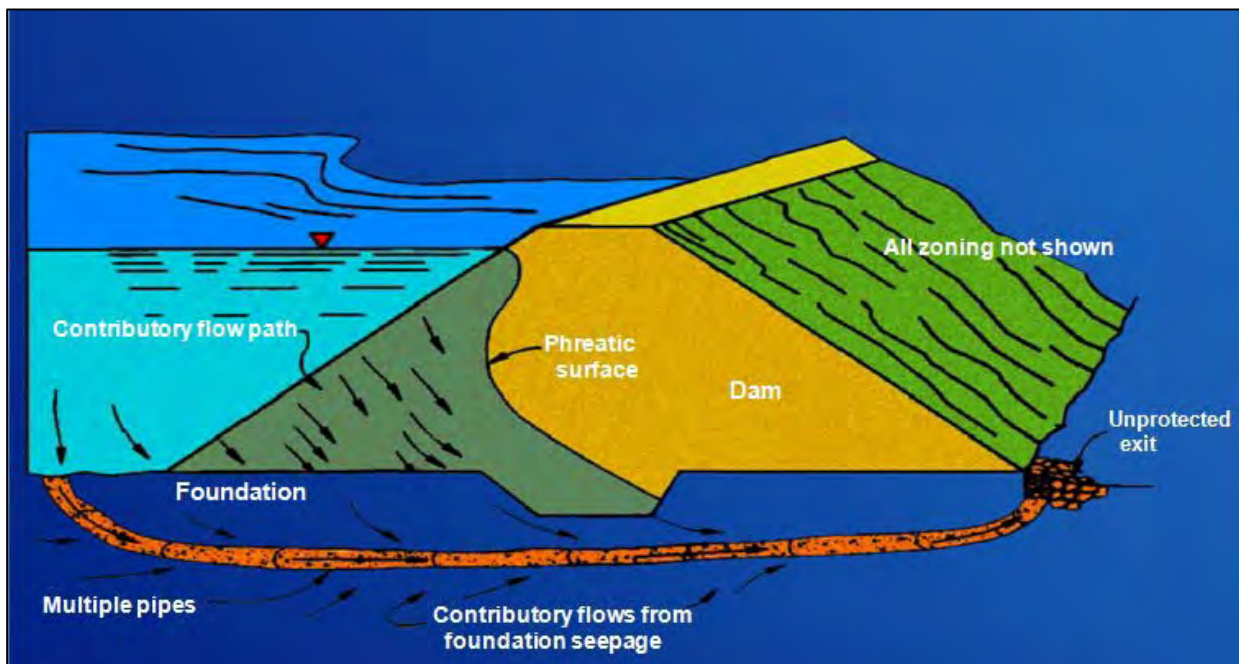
Illustration of backward erosion piping showing the fully formed pipe connected from downstream to upstream.
